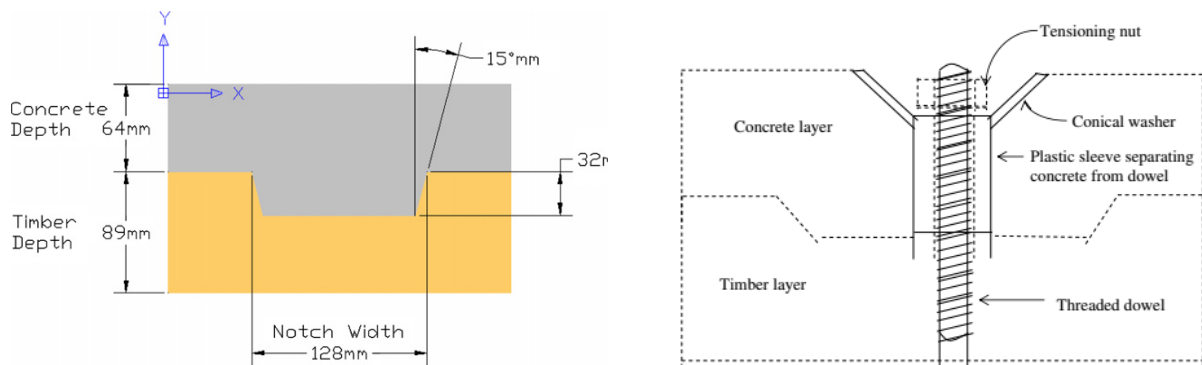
Notched shear connection in TCC beams, Gutkowski et al. [69]
